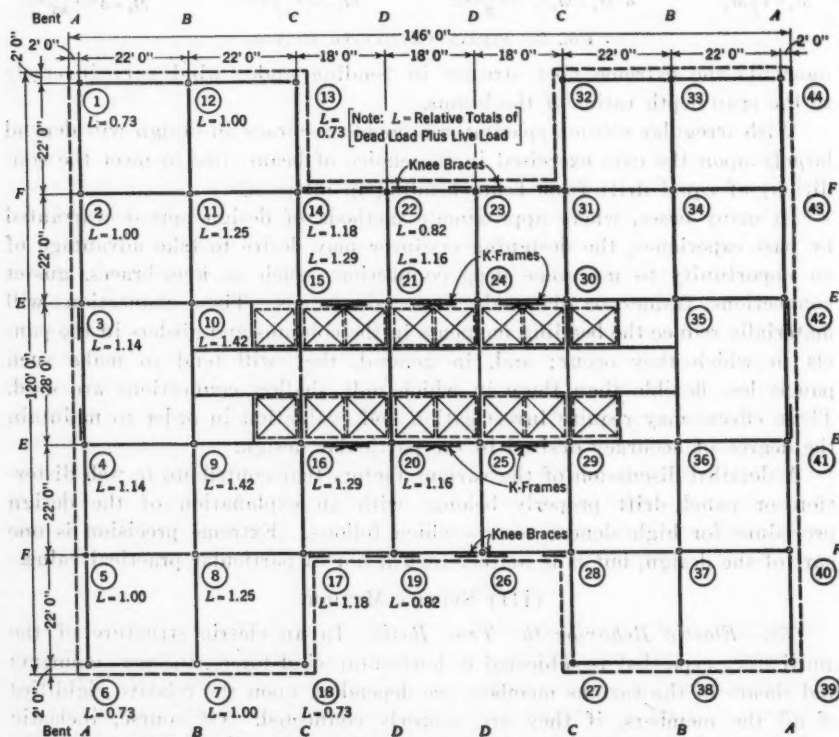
FLOOR PLAN SEVENTY STORIES FROM TOP OF BUILDING ANALYZED.
